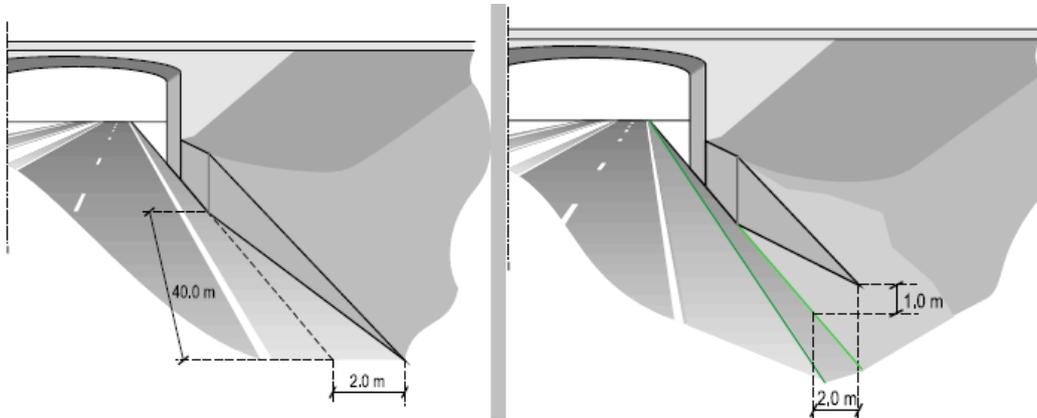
Example of end design of a retaining wall close to the carriageway[B.16]
